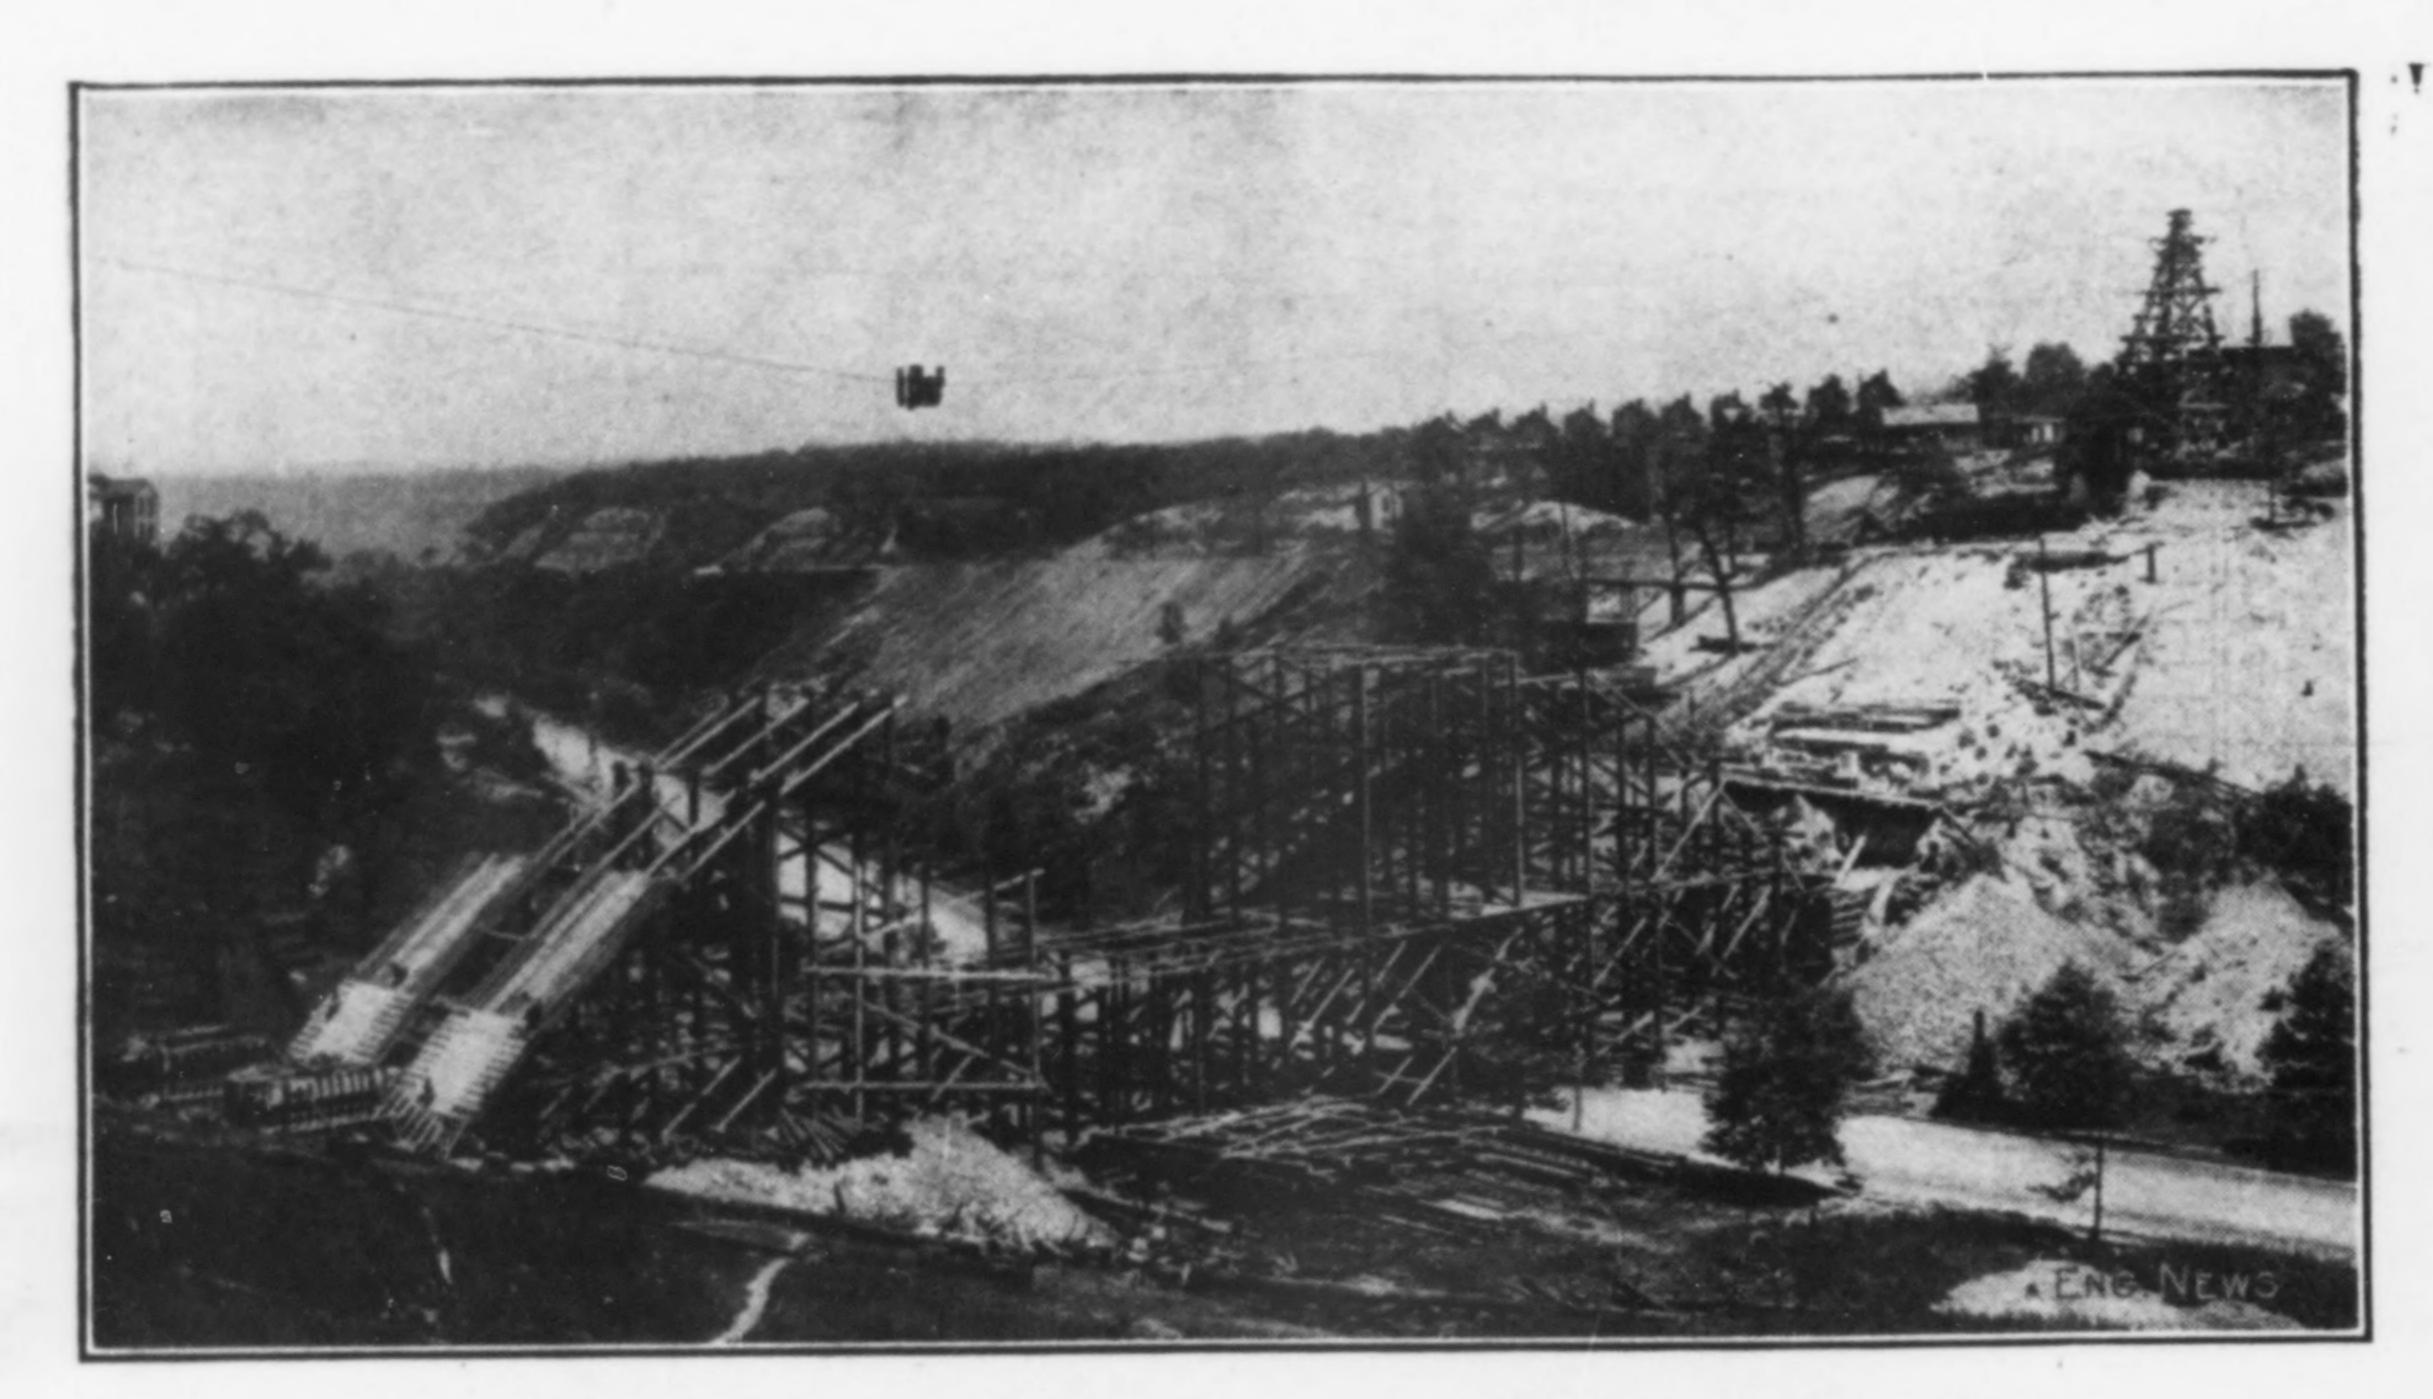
BUILDING THE CENTERING FOR THE LARIMER AVE. ARCH
